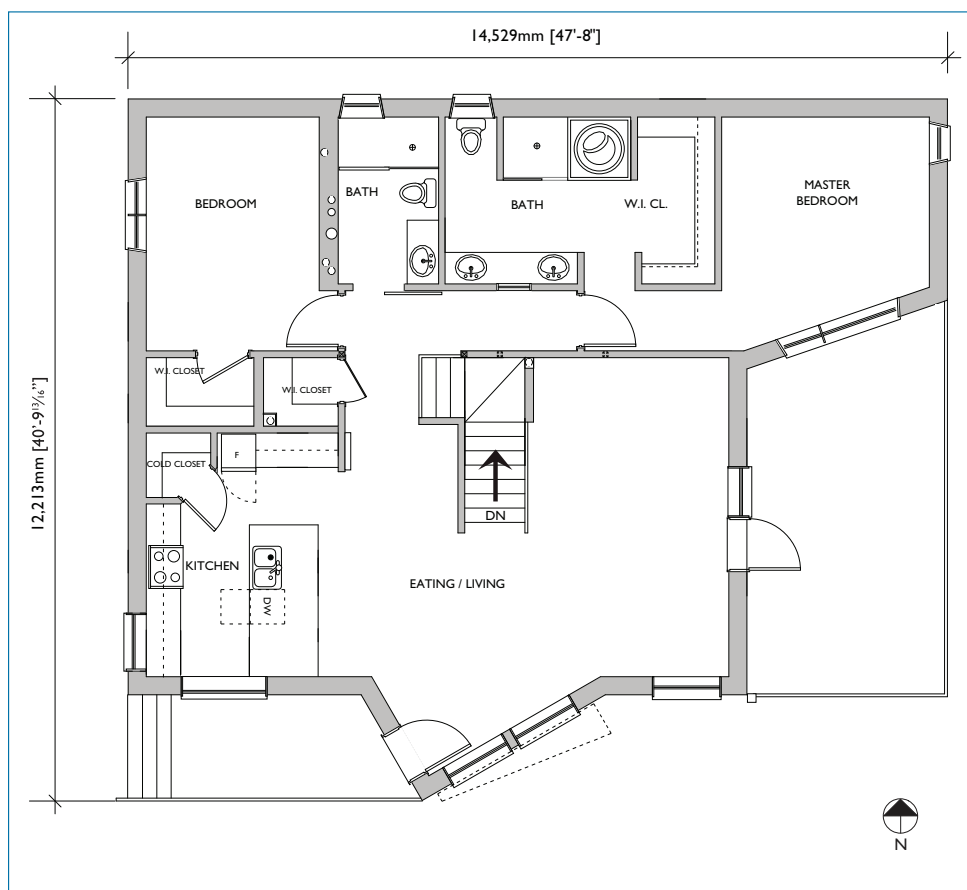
Main floor plan of the EchoHaven EQUilibrium™ Project
